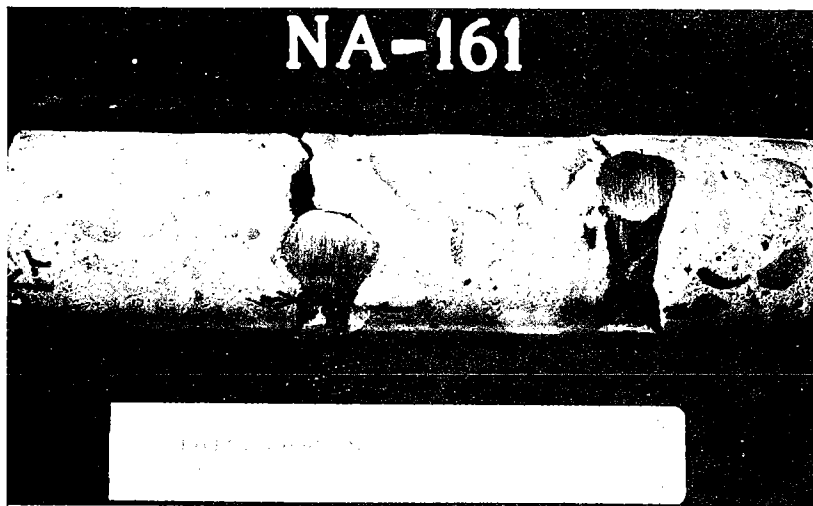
Weak zones at steel; note that the steel did not rotate or chew the surrounding concrete.
